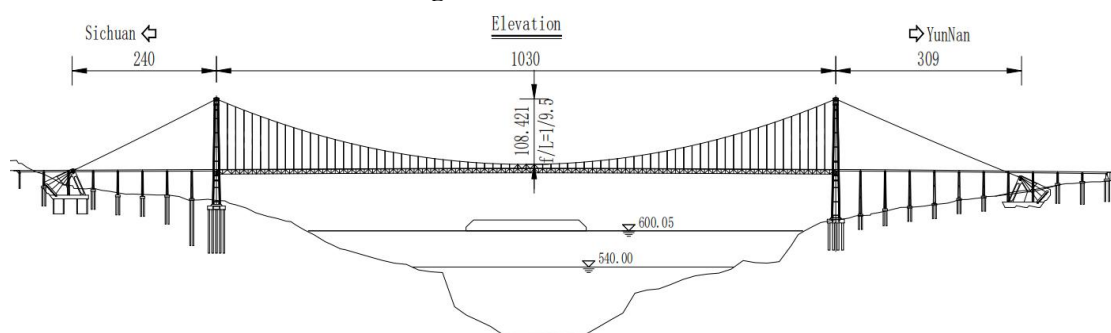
Layout of Sichuan Kahaluo Jinsha River Bridge (Unit: m)
